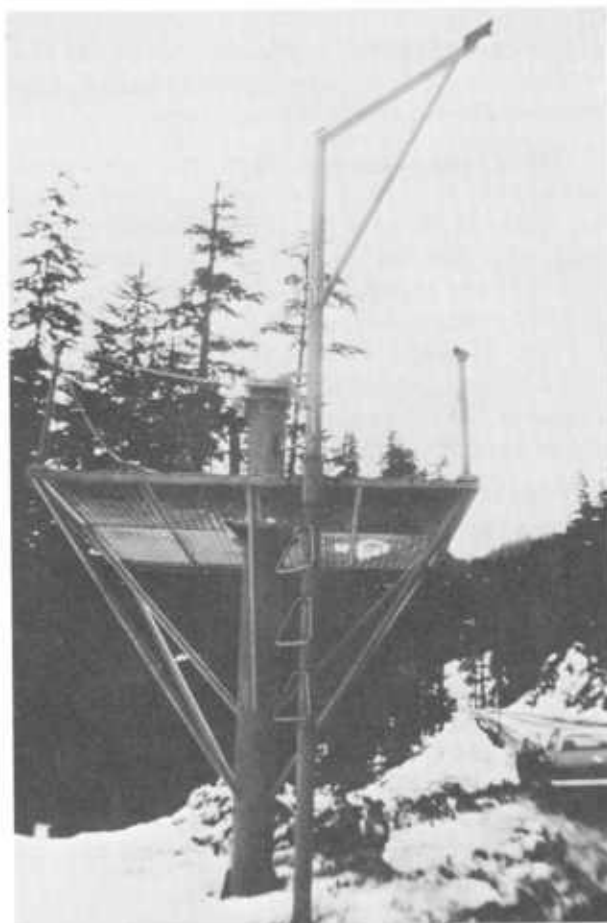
75-mm recoilless rifle tower on Washington State highway. Winches are used to lift gun onto tower.
